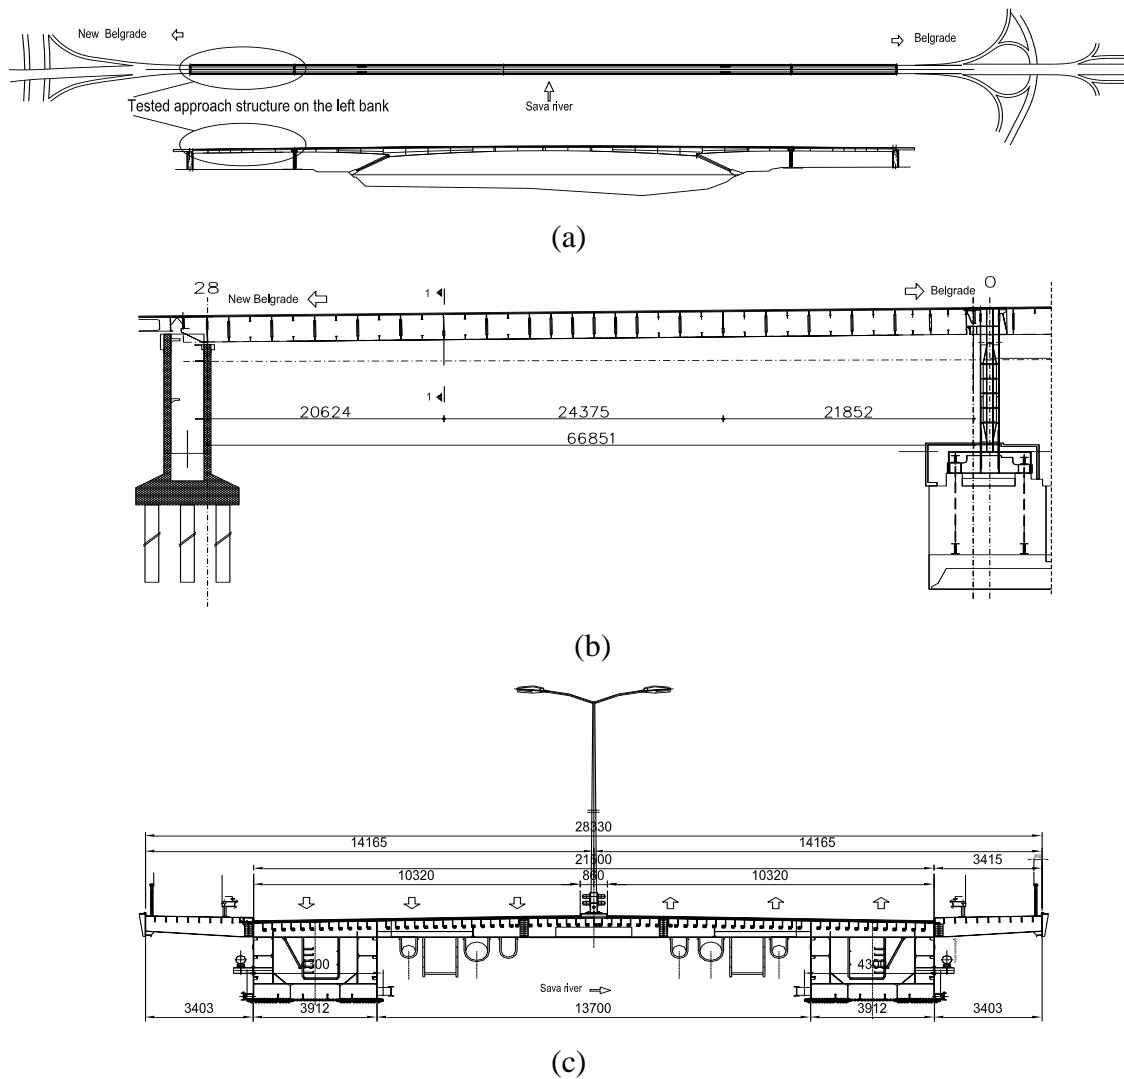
Layout of GAZELA bridge structure: (a) position of tested part (b) Longitudinal section (side view) and (c) cross section (front view) [107]
